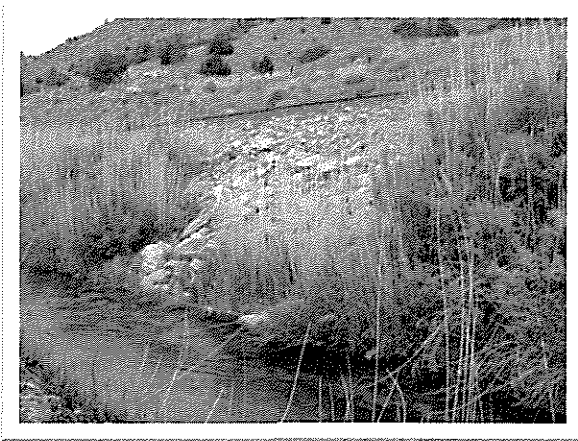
Big Springs Ditch with MRL rail line above, and rock reinforced embankment.
